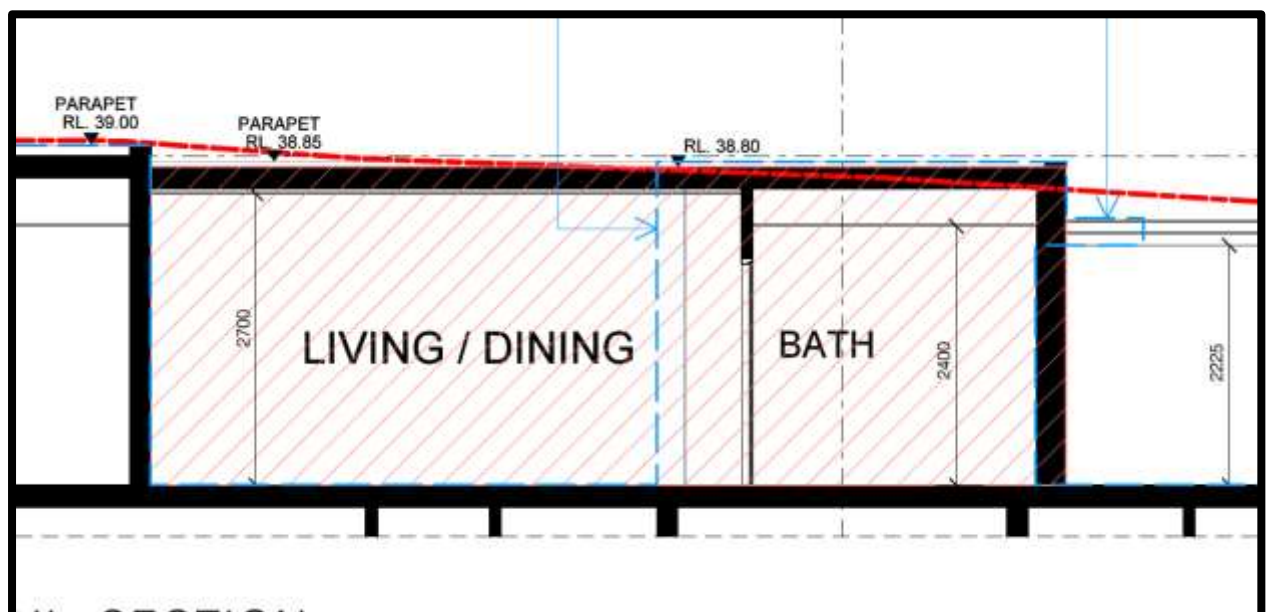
Extract of cross section of proposed studio unit (Source: Loucas Architects, 2020).
